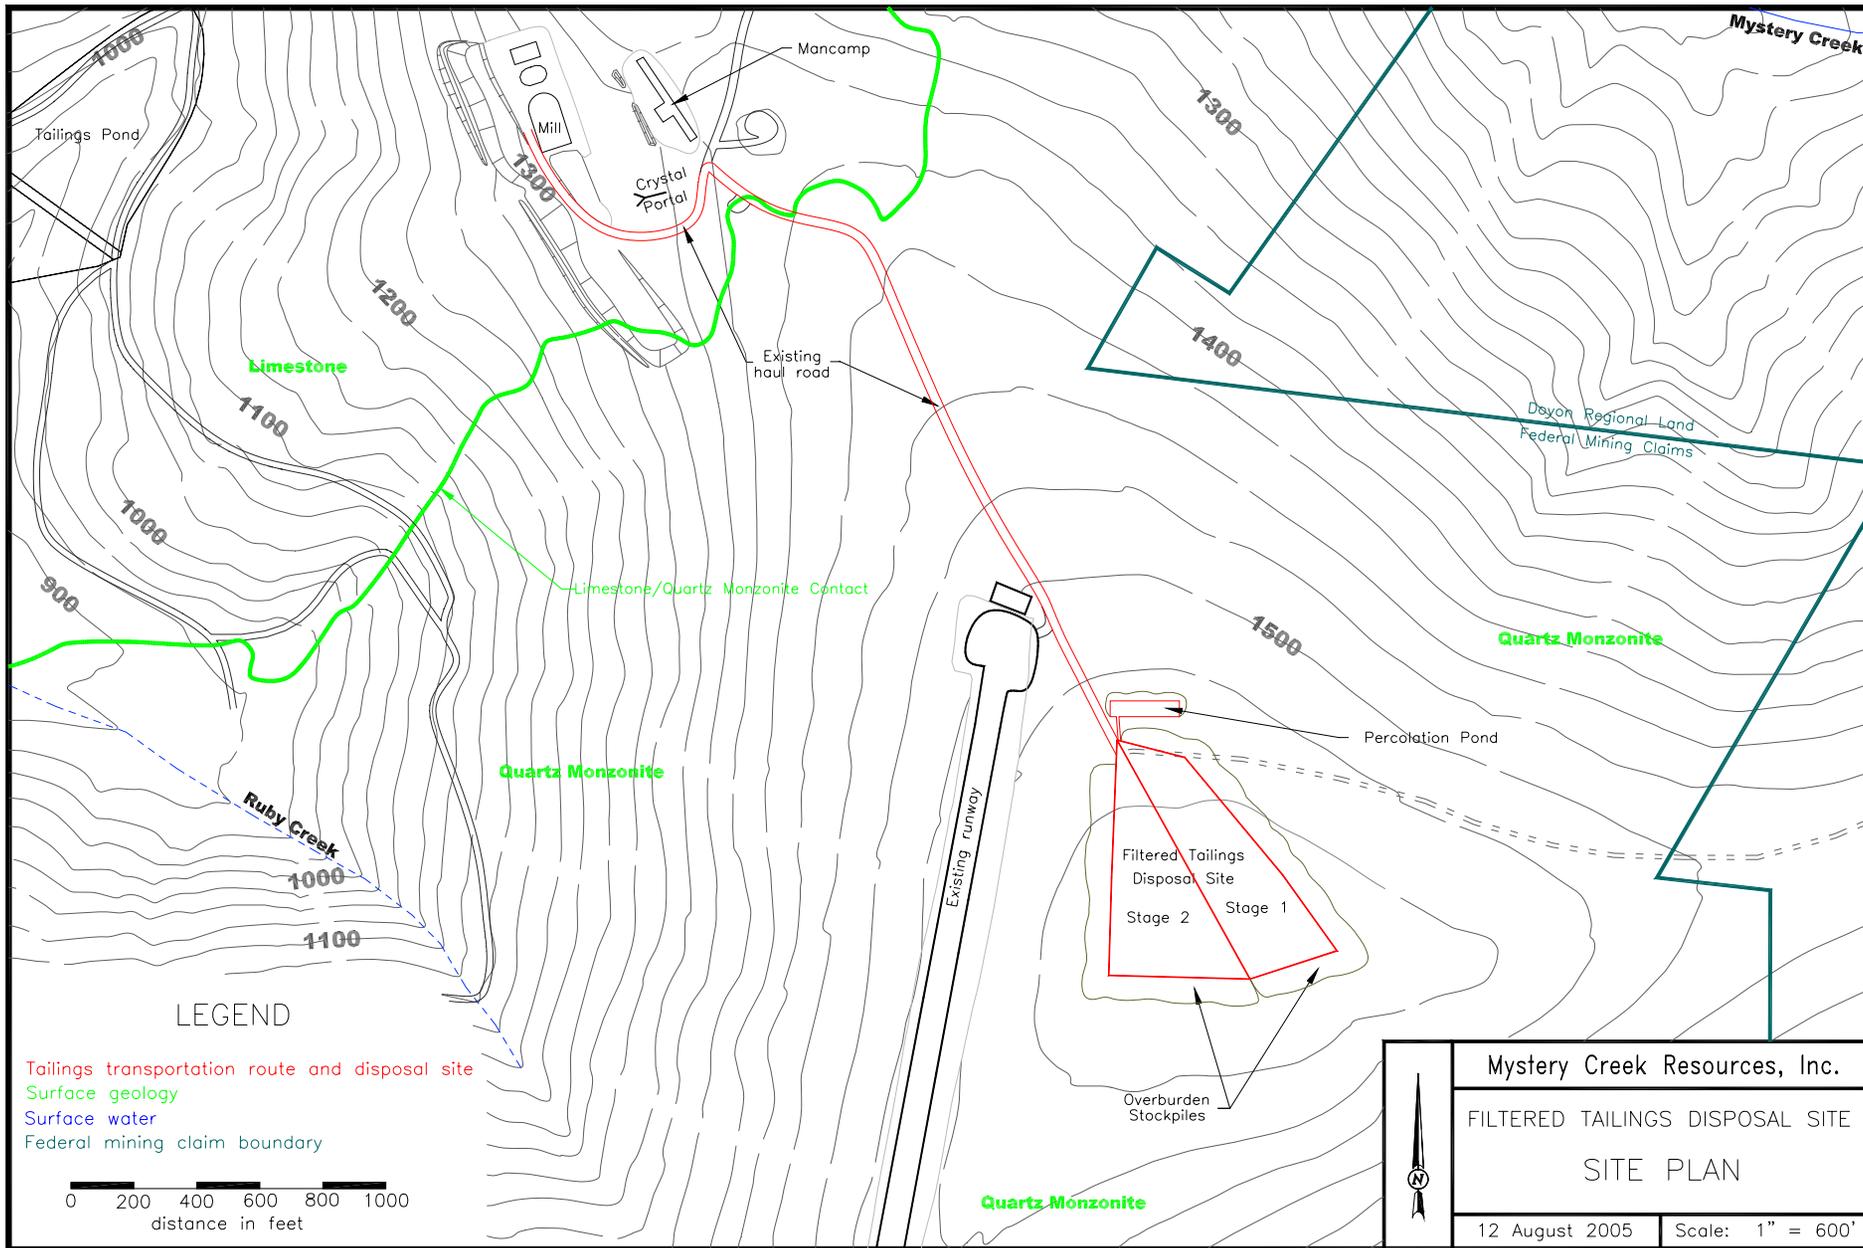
FILTERED TAILINGS DISPOSAL SITE PLAN
